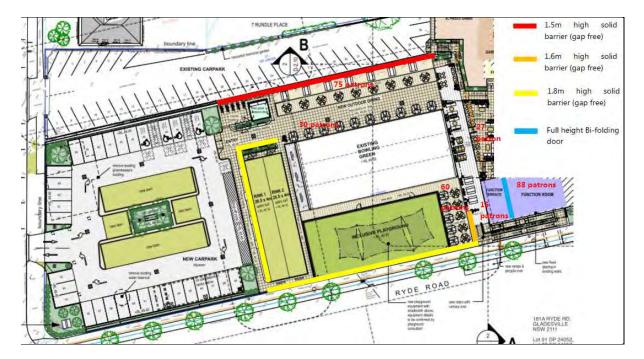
Plan from acoustic report detailing proposed acoustic barriers
